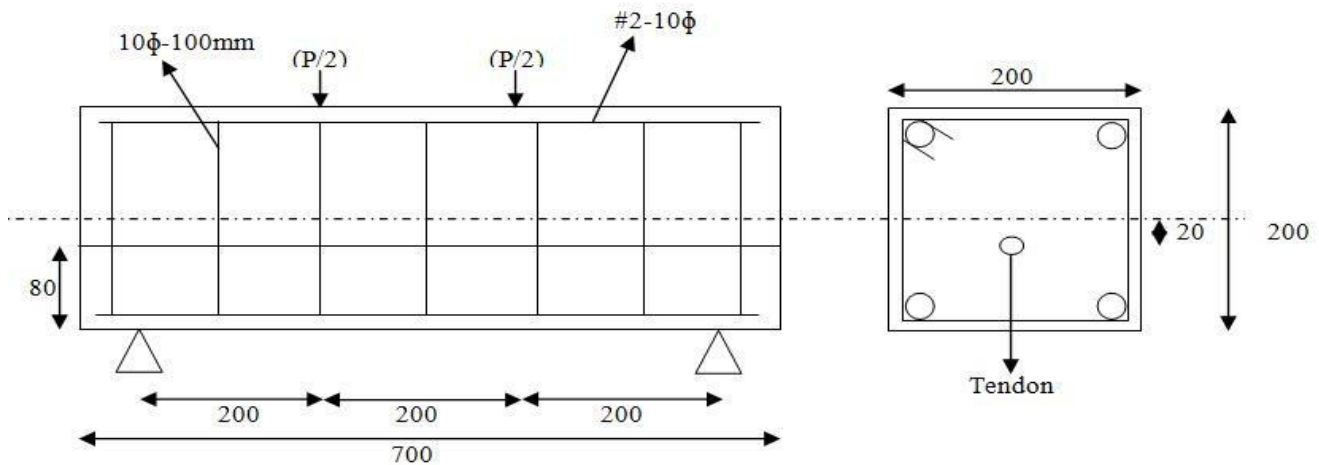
Concrete sections and cable profile of pre-stressed beams.
